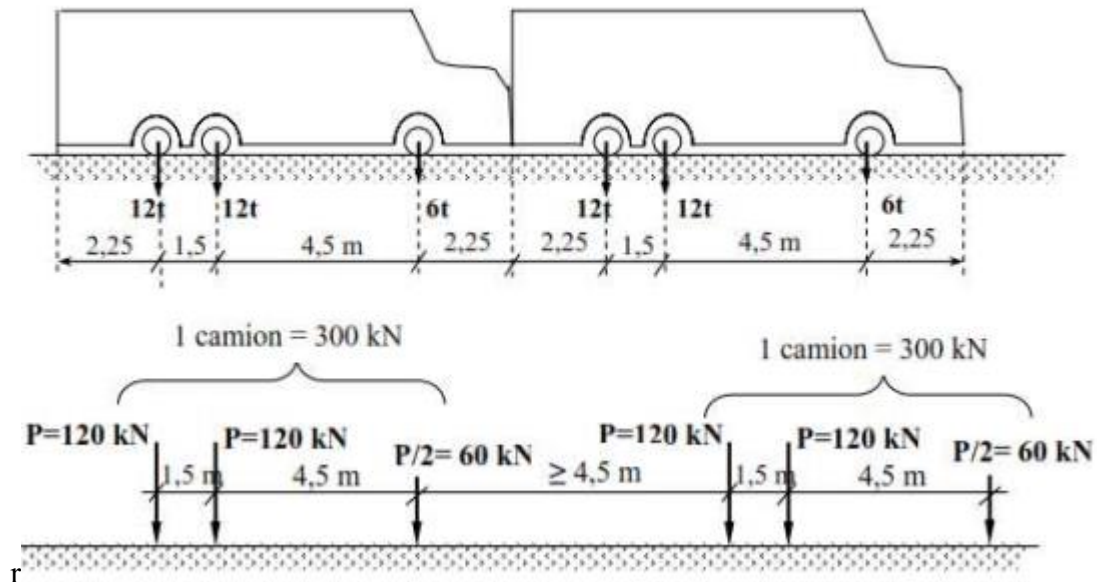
Longitudinal disposition of load system Bc. (Bourrel & Gourdou,(2016))
